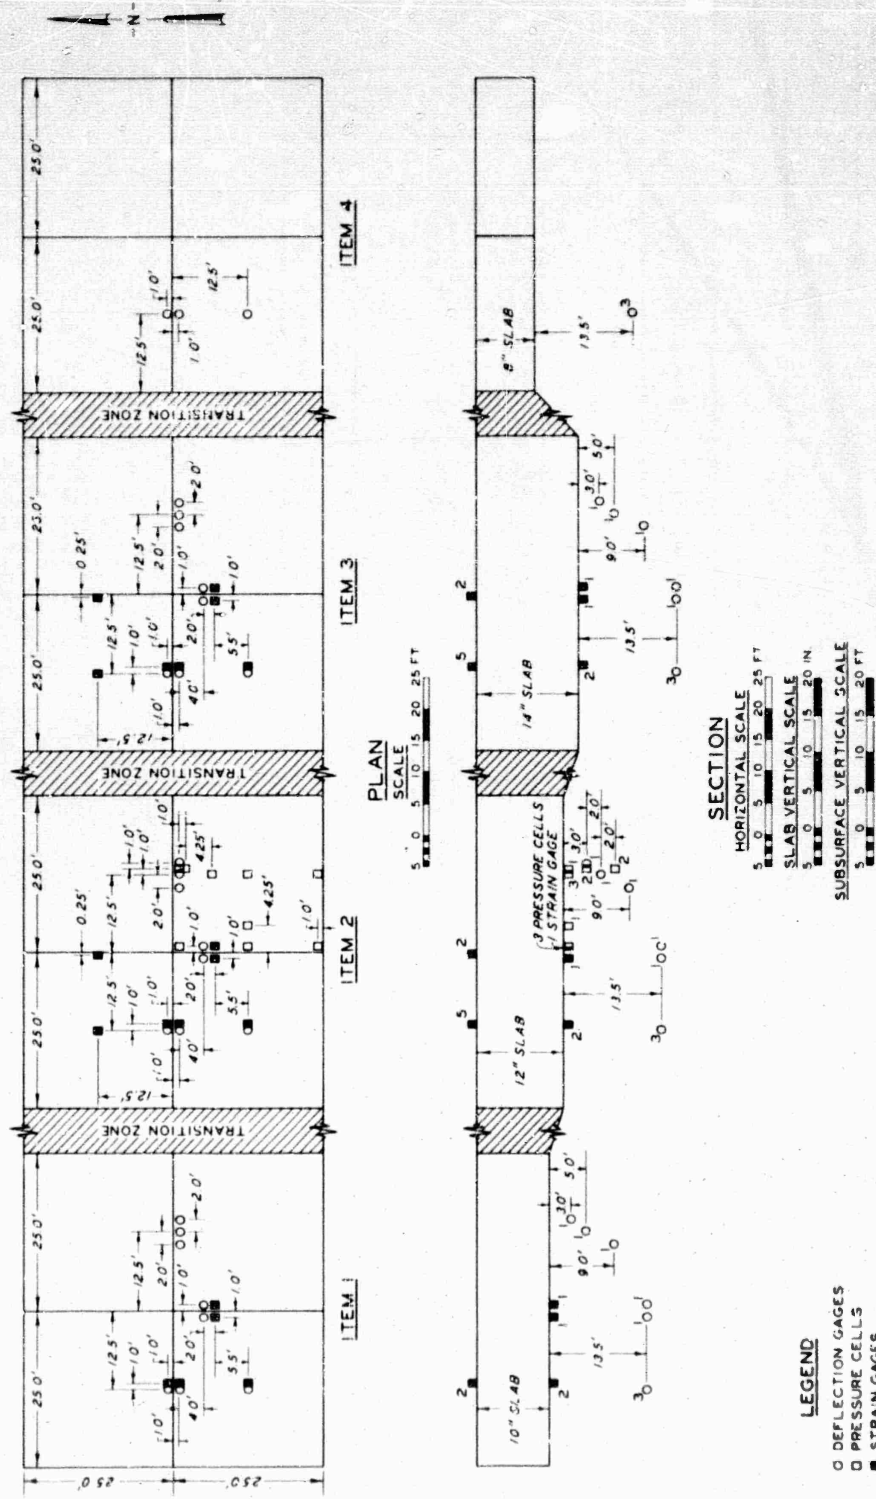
Instrumentation Layout for Rigid Pavement Test Section
